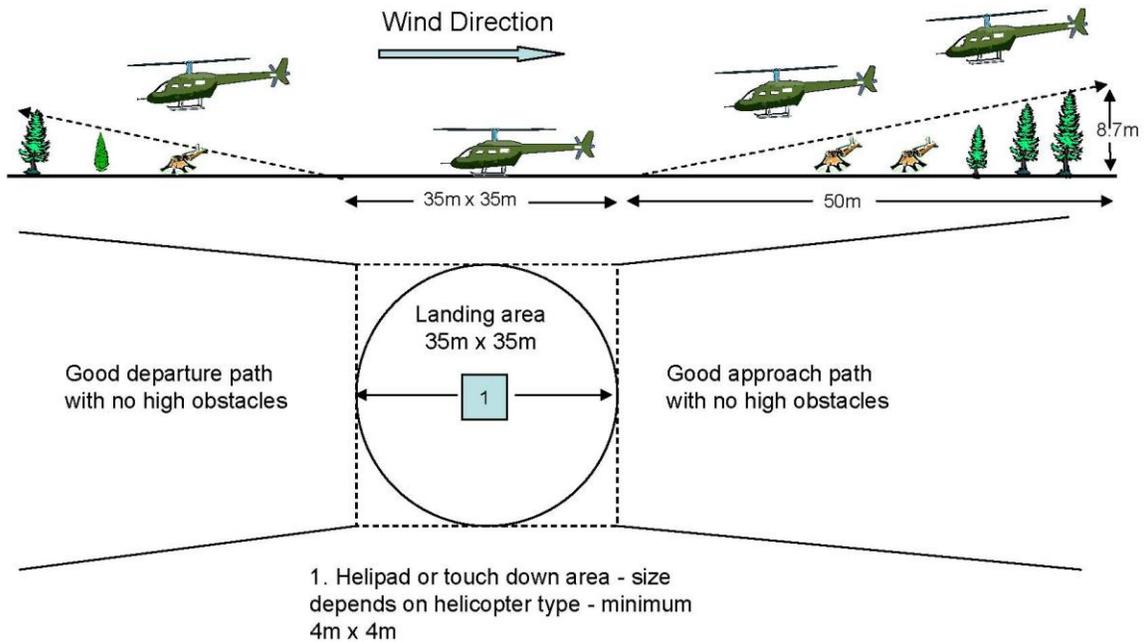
Elevation and plan views for suggested minimum dimensions of a temporary helicopter landing area
